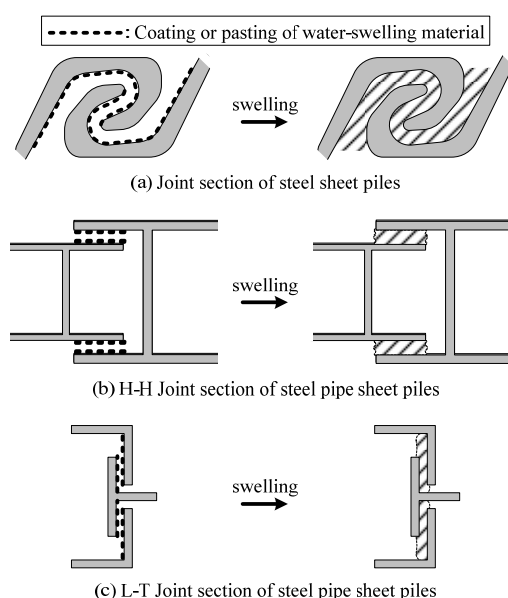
Water cut-off treatment on joint section of steel sheet piles or steel pipe sheet using water swelling materials.
